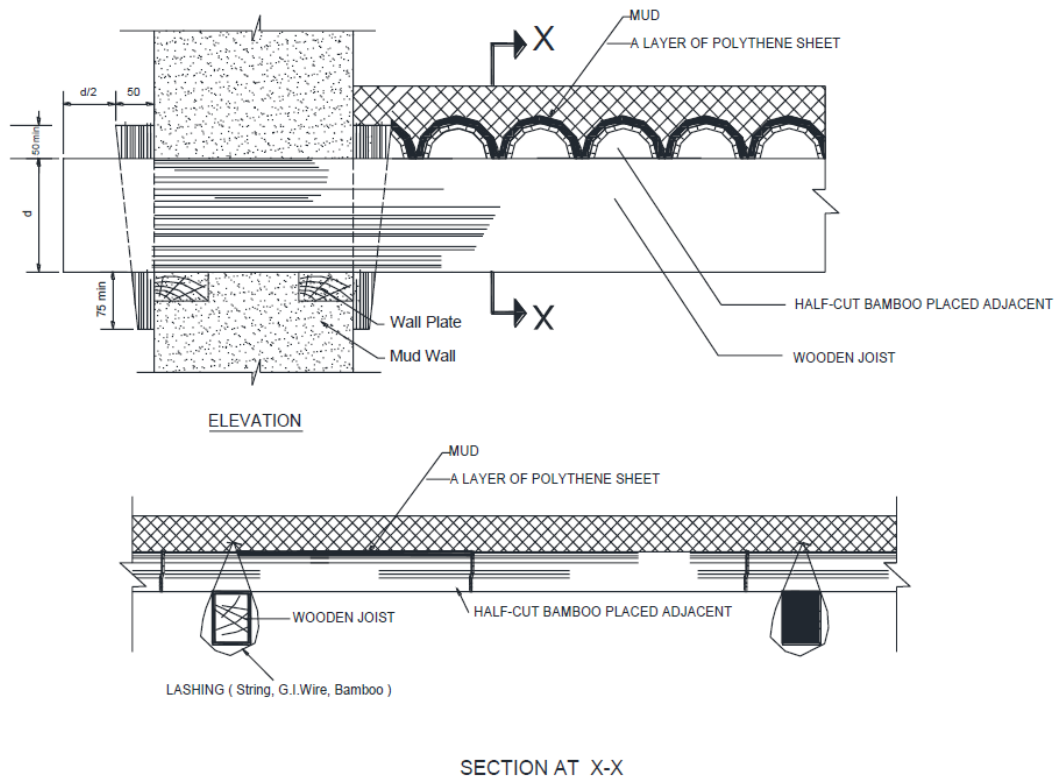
Details of Fixing Bridging Material to Joists and Rafters
